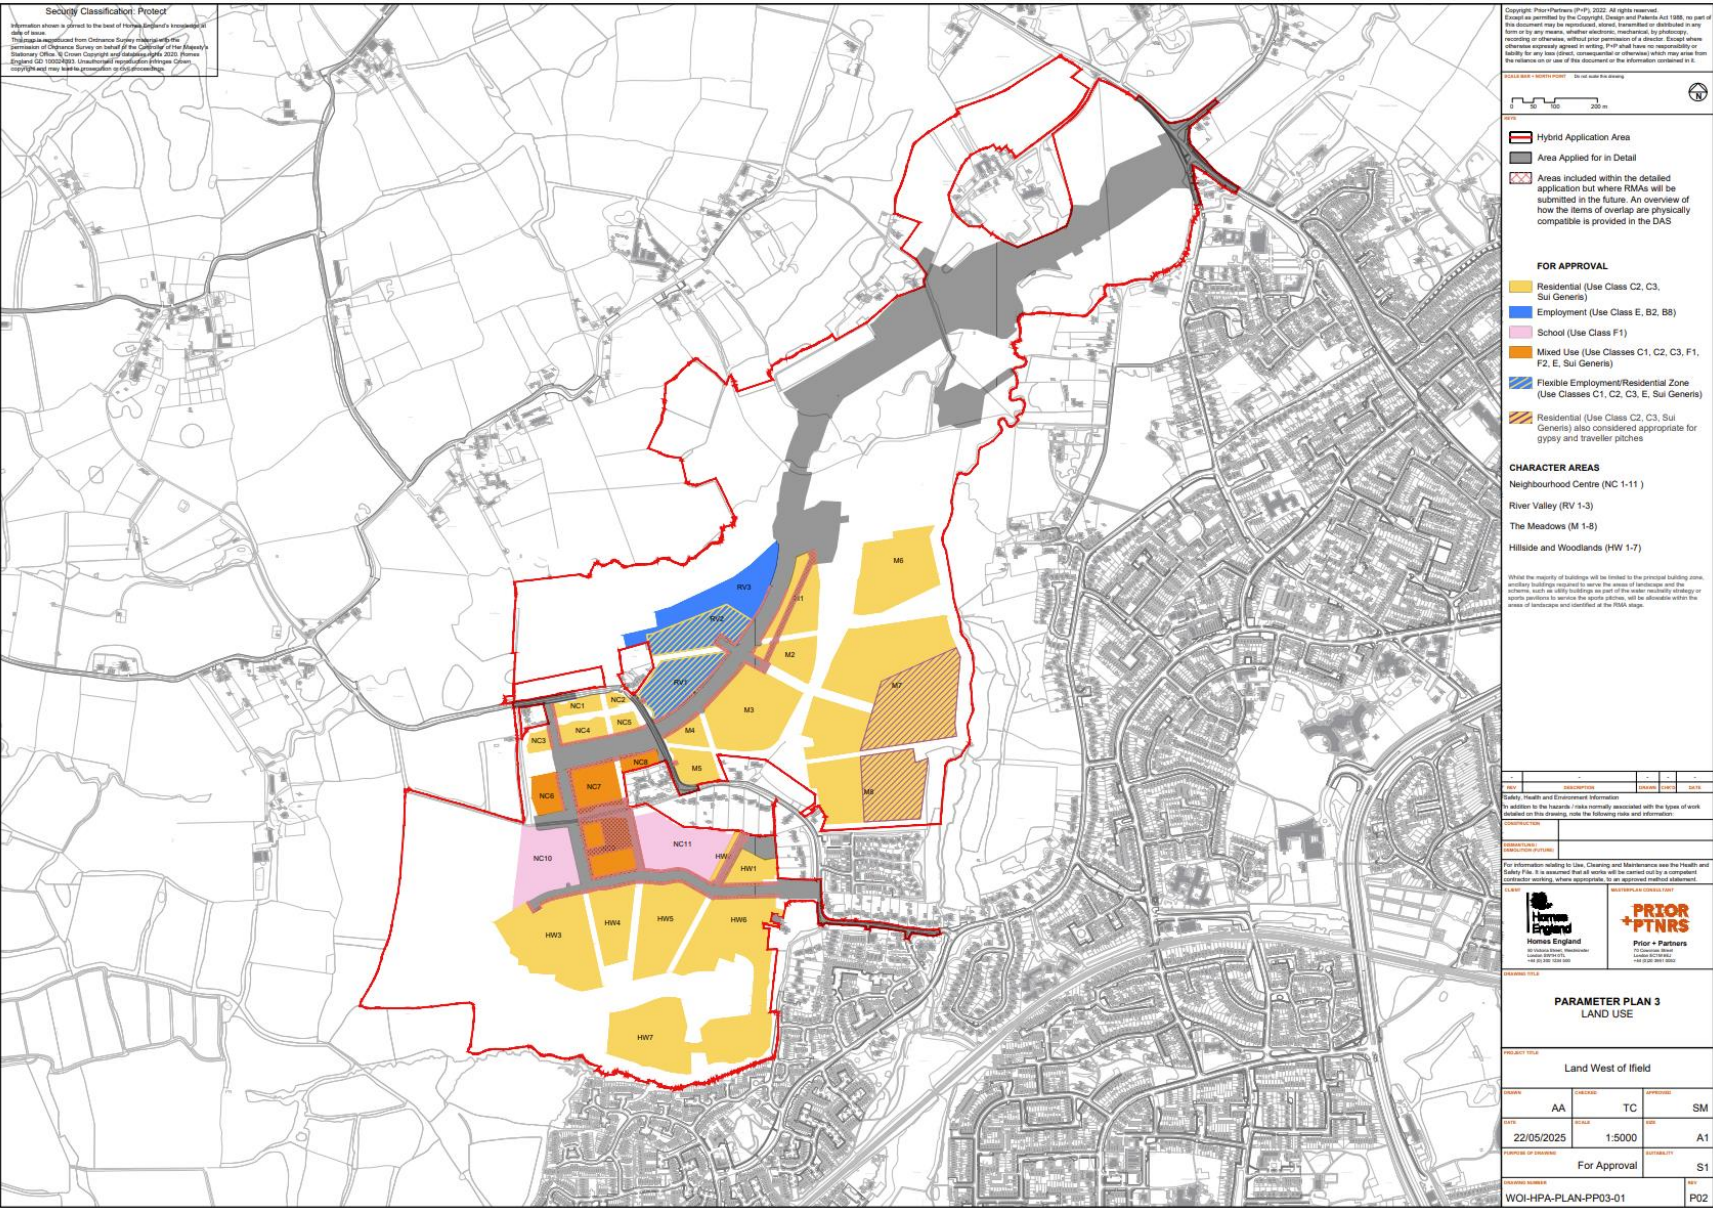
Land-Use Parameter Plan (Parameter Plan 3: Land Use. WOI-HPA-PLAN-PP03-01)
